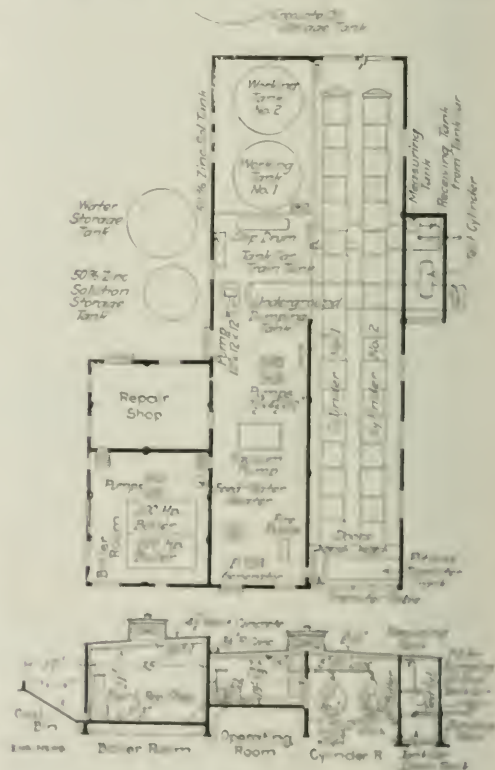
PLAN AND SECTIONAL ELEVATION OF THE TREATING PLANT, LEBLANCH & NASHVILLE R.R.
